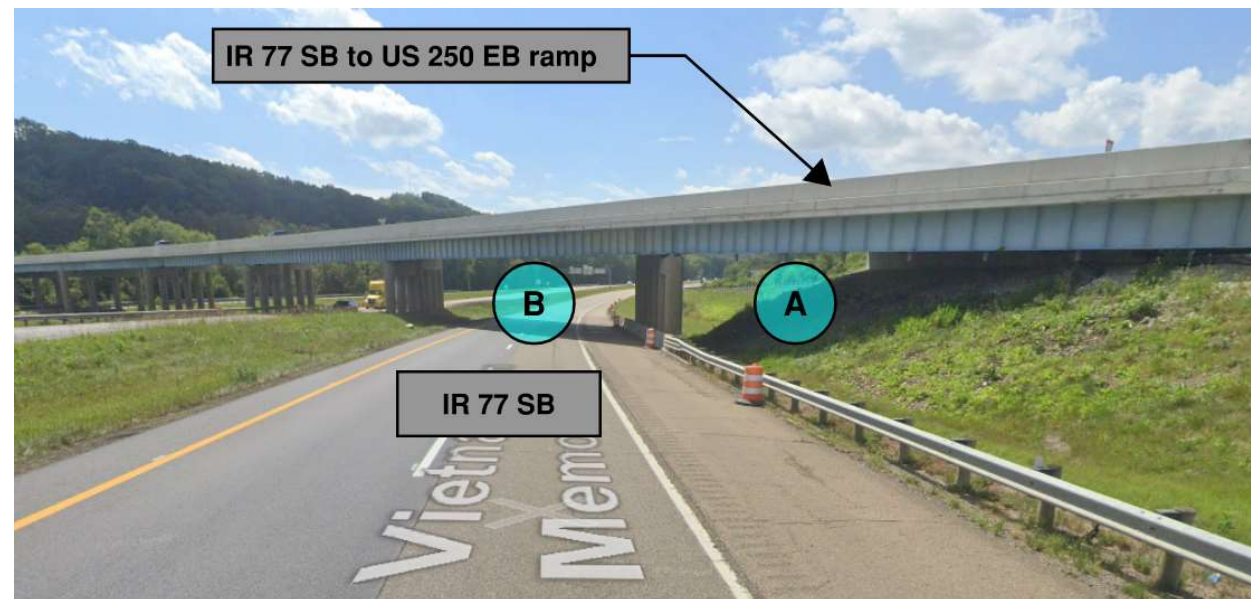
View of Span Arrangement of Existing IR 77 SB to US 250 EB Ramp Bridge
